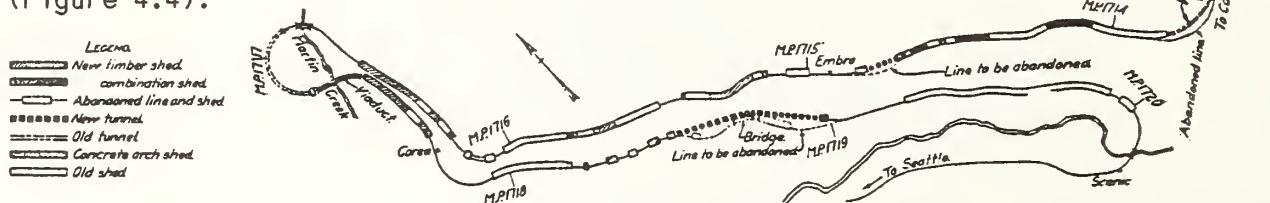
Location of snow sheds west of Cascade Tunnel (from Railway Age Gazette 1917).
